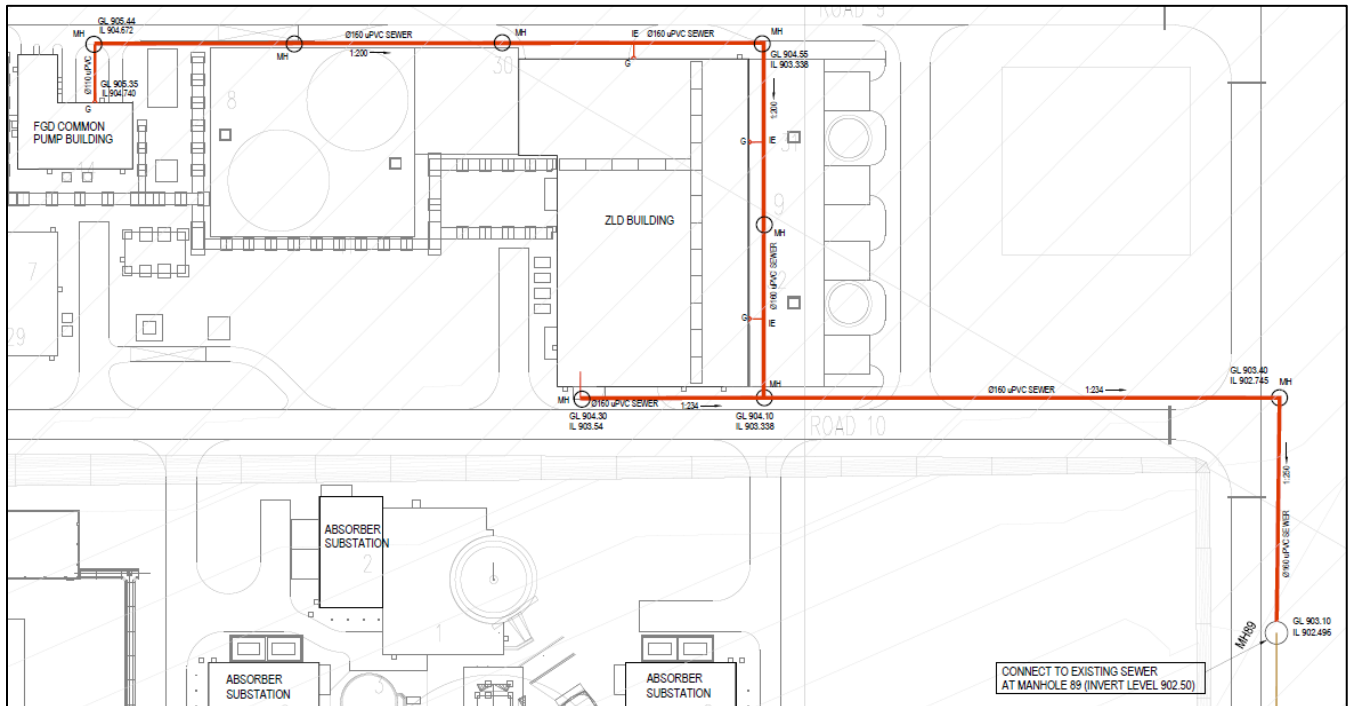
Layout plan for sewage network for the FGD Common Pump Building and ZLD Building
